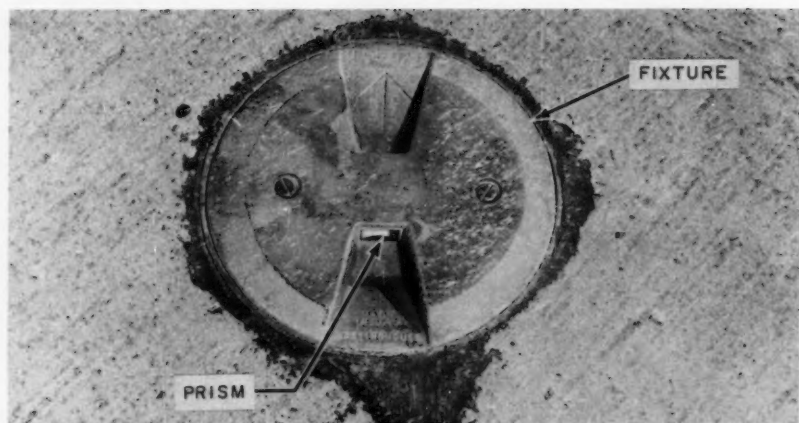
STRUCTURAL 6-IN. INSET TYPE OPEN FIXTURE
